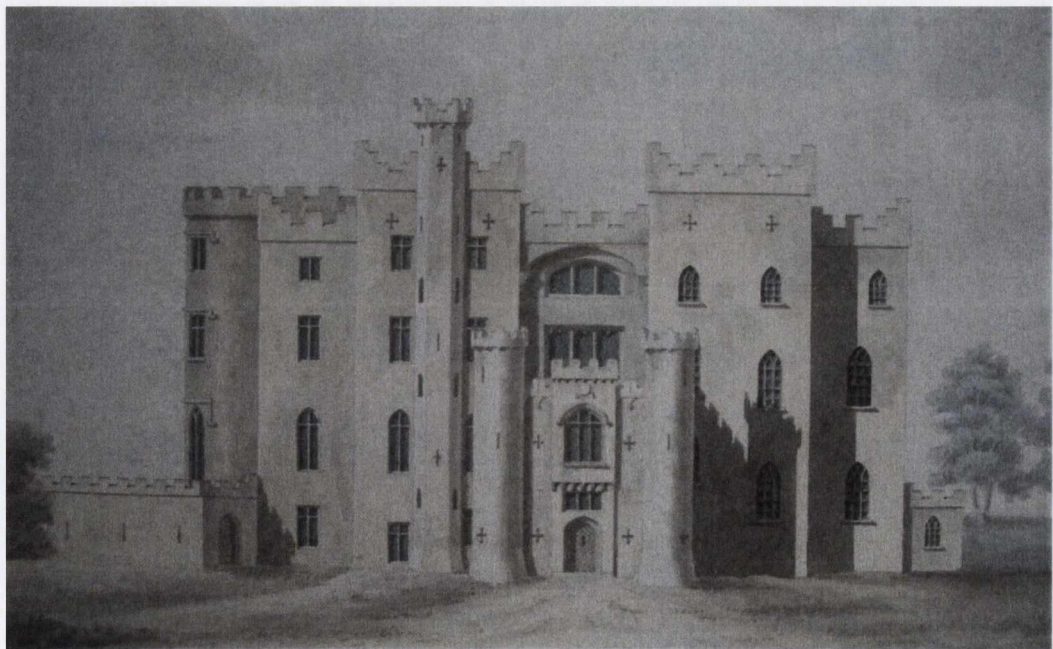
Killeen Castle, proposal first scheme, elevation of principal façade, watercolour, Francis Johnston, [Jan. 1802], Pakenham Archive, Tullynally Castle, Co. Westmeath.
